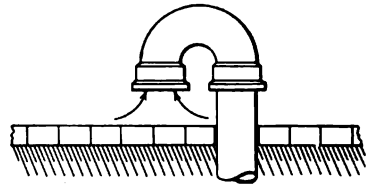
Return Bend Used to Terminate Air Inlet or Outlet Pipe.
